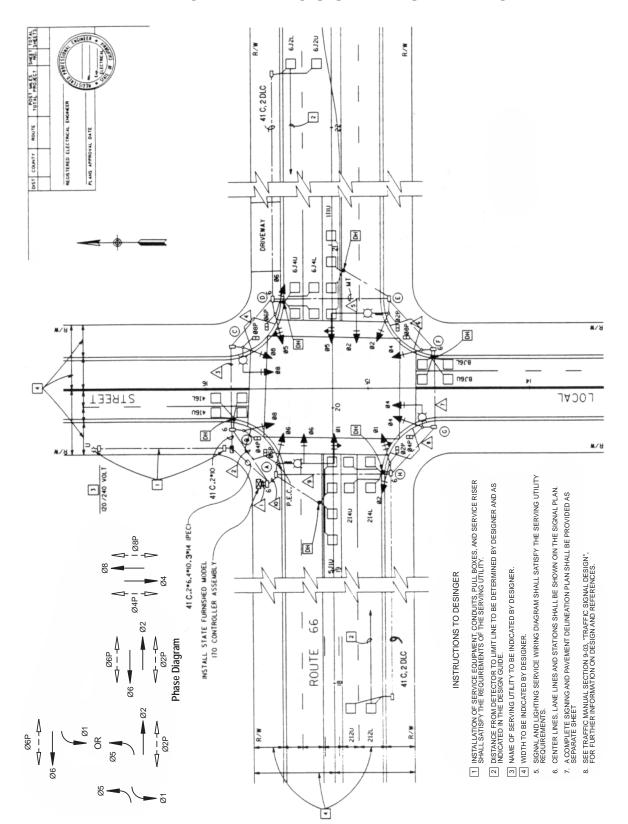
TYPICAL TRAFFIC SIGNAL INSTALLATION
